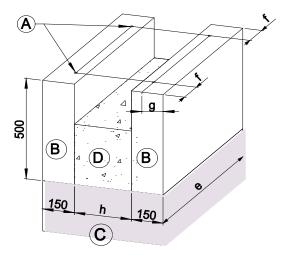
Foundation for securing with floor bracket (dimensions in mm)
